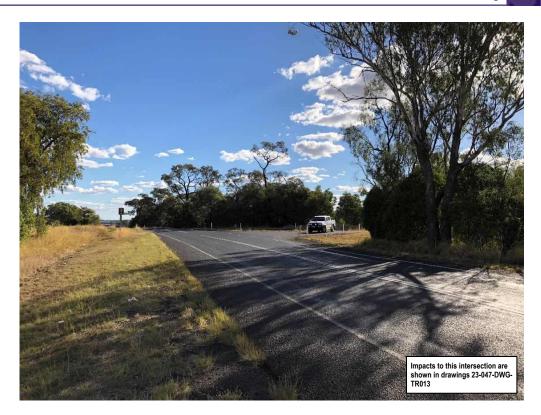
MacAlister Bell Road / Bunya Highway Intersection (Location 13) Looking West
